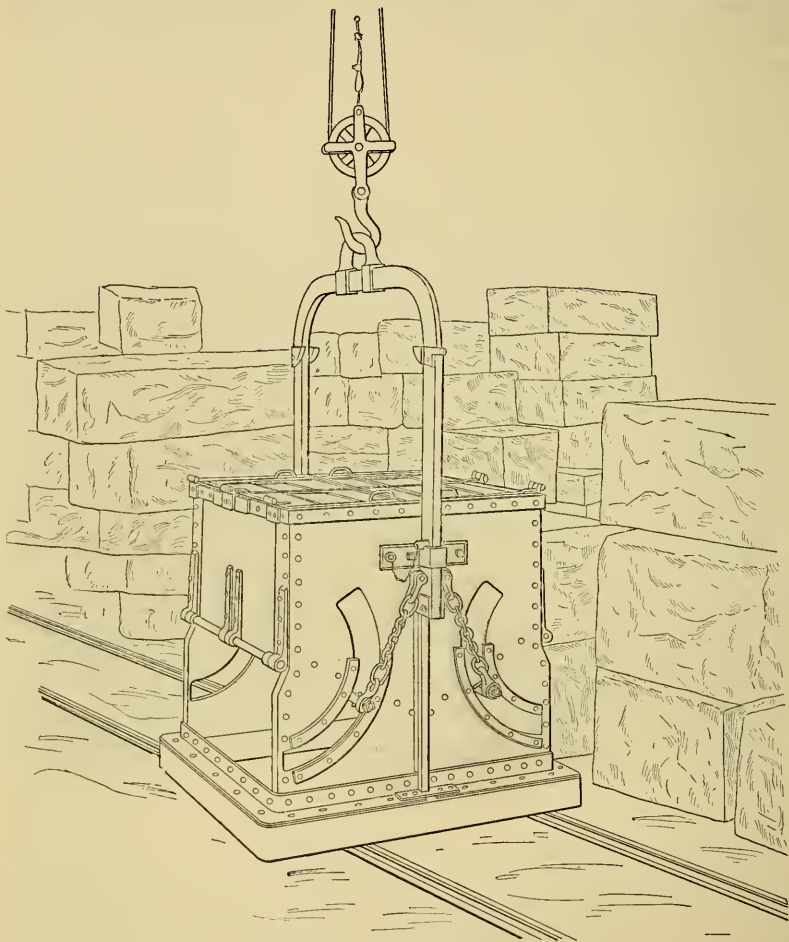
BUCKET FOR DEPOSITING CONCRETE.
